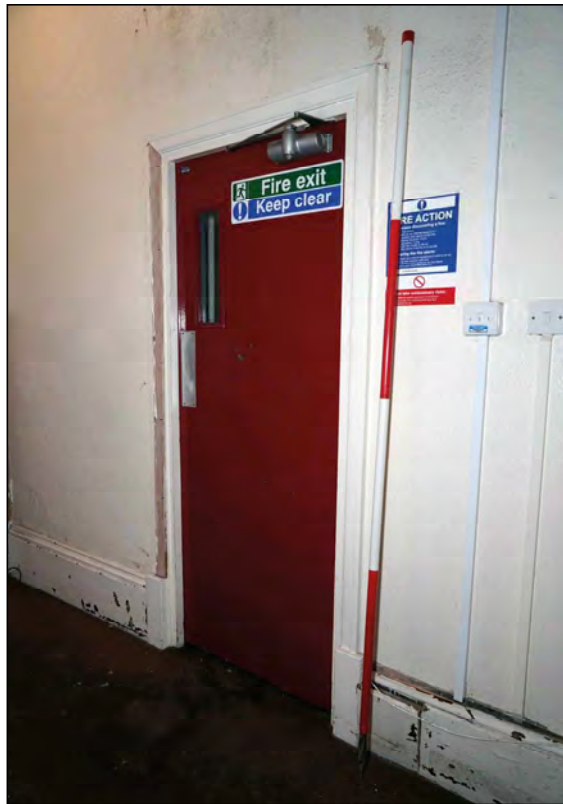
Doorway inserted between Nos. 2 and 4 at ground floor level, looking west
